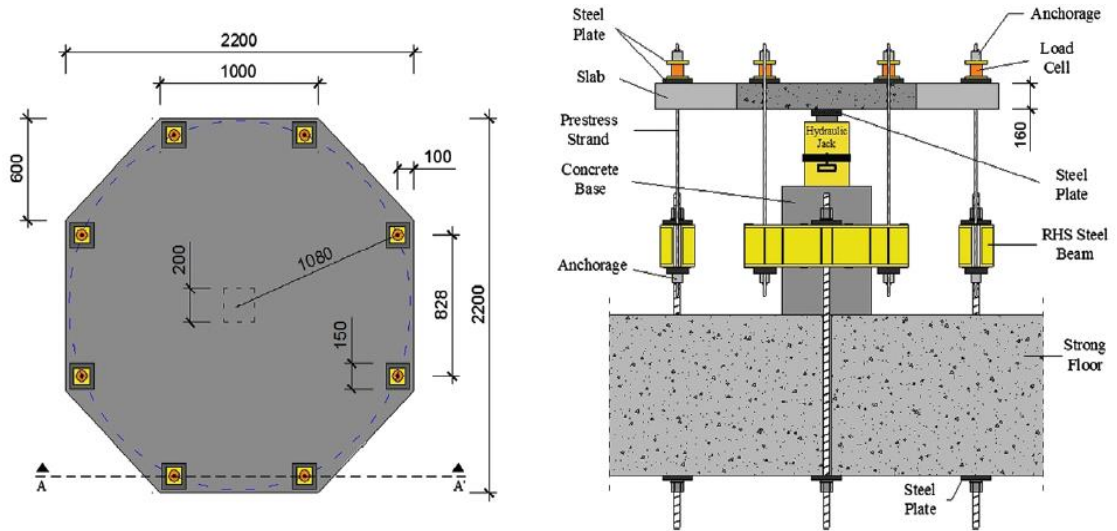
Geometry of specimen: top view and section A–A' (All dimensions in mm) (Gouveia et al, 2018)
